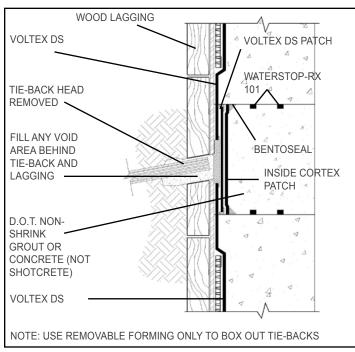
TIE-BACK BOX OUT DETAIL
